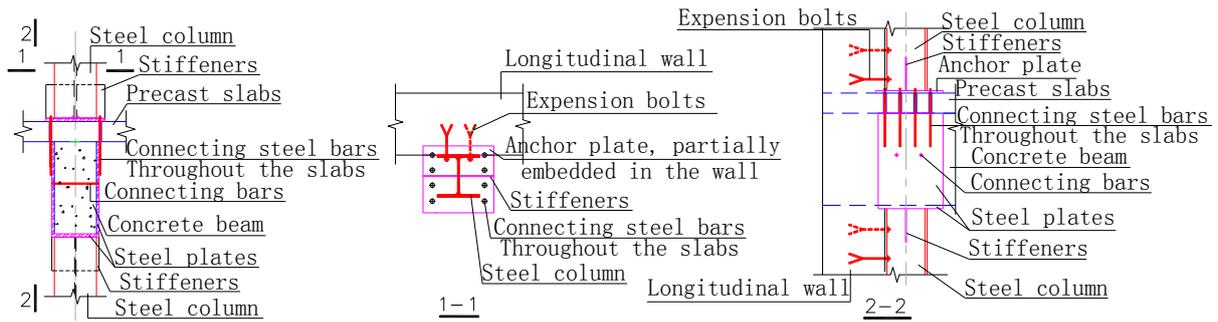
Connection of the retrofit steel columns and the concrete beam
